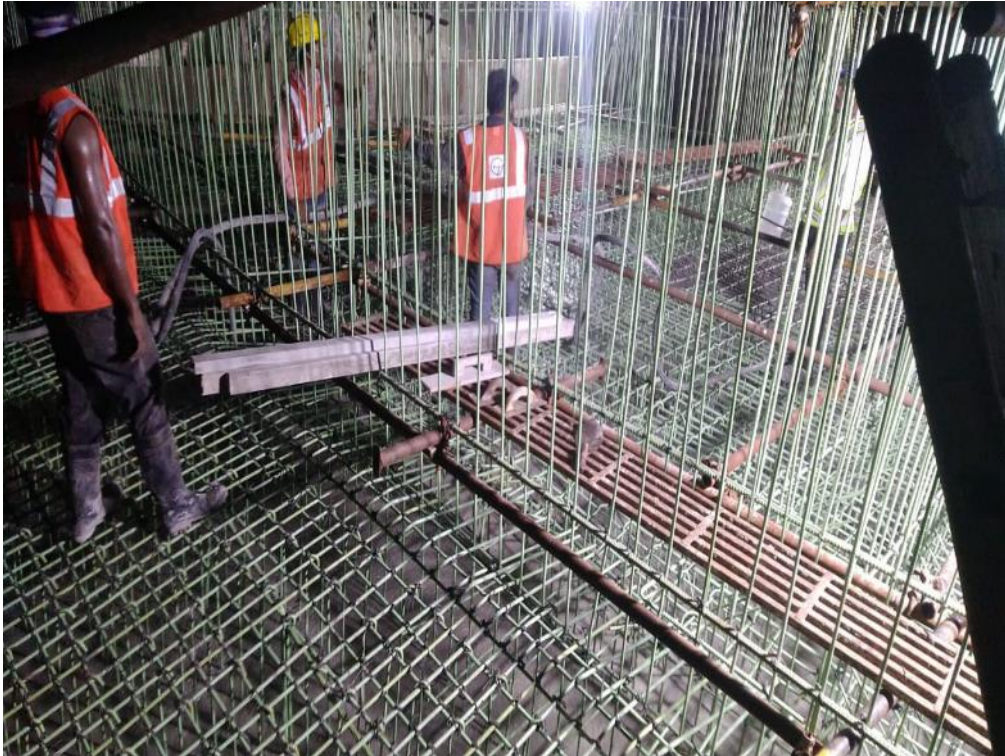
LMP A2 Abutment Foundation concrete pouring in progress
